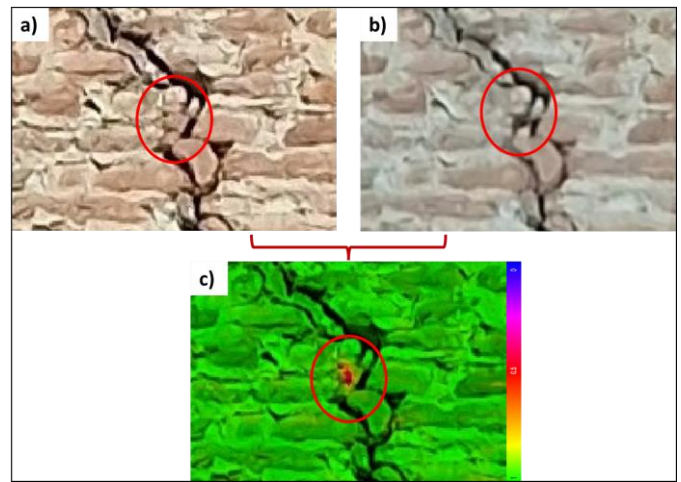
Detail of the Change Detection Map showing the brick detachment from the facing wall of Santa Apollonia Church.
